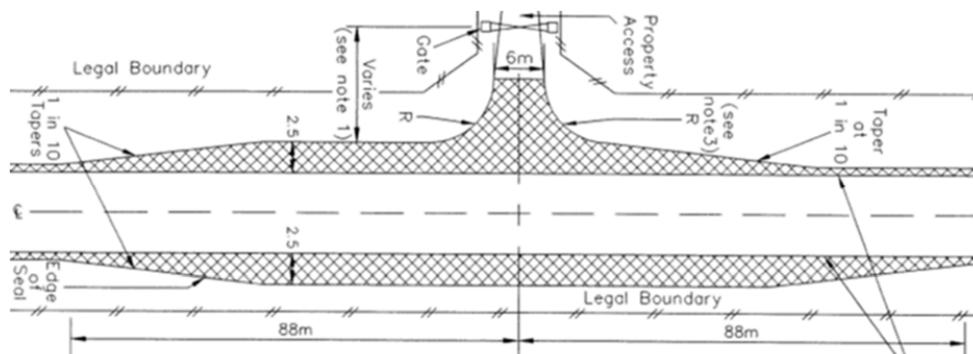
Localised Widening at an Access Intersection as per Figure 12.3 of the CODC District Plan
